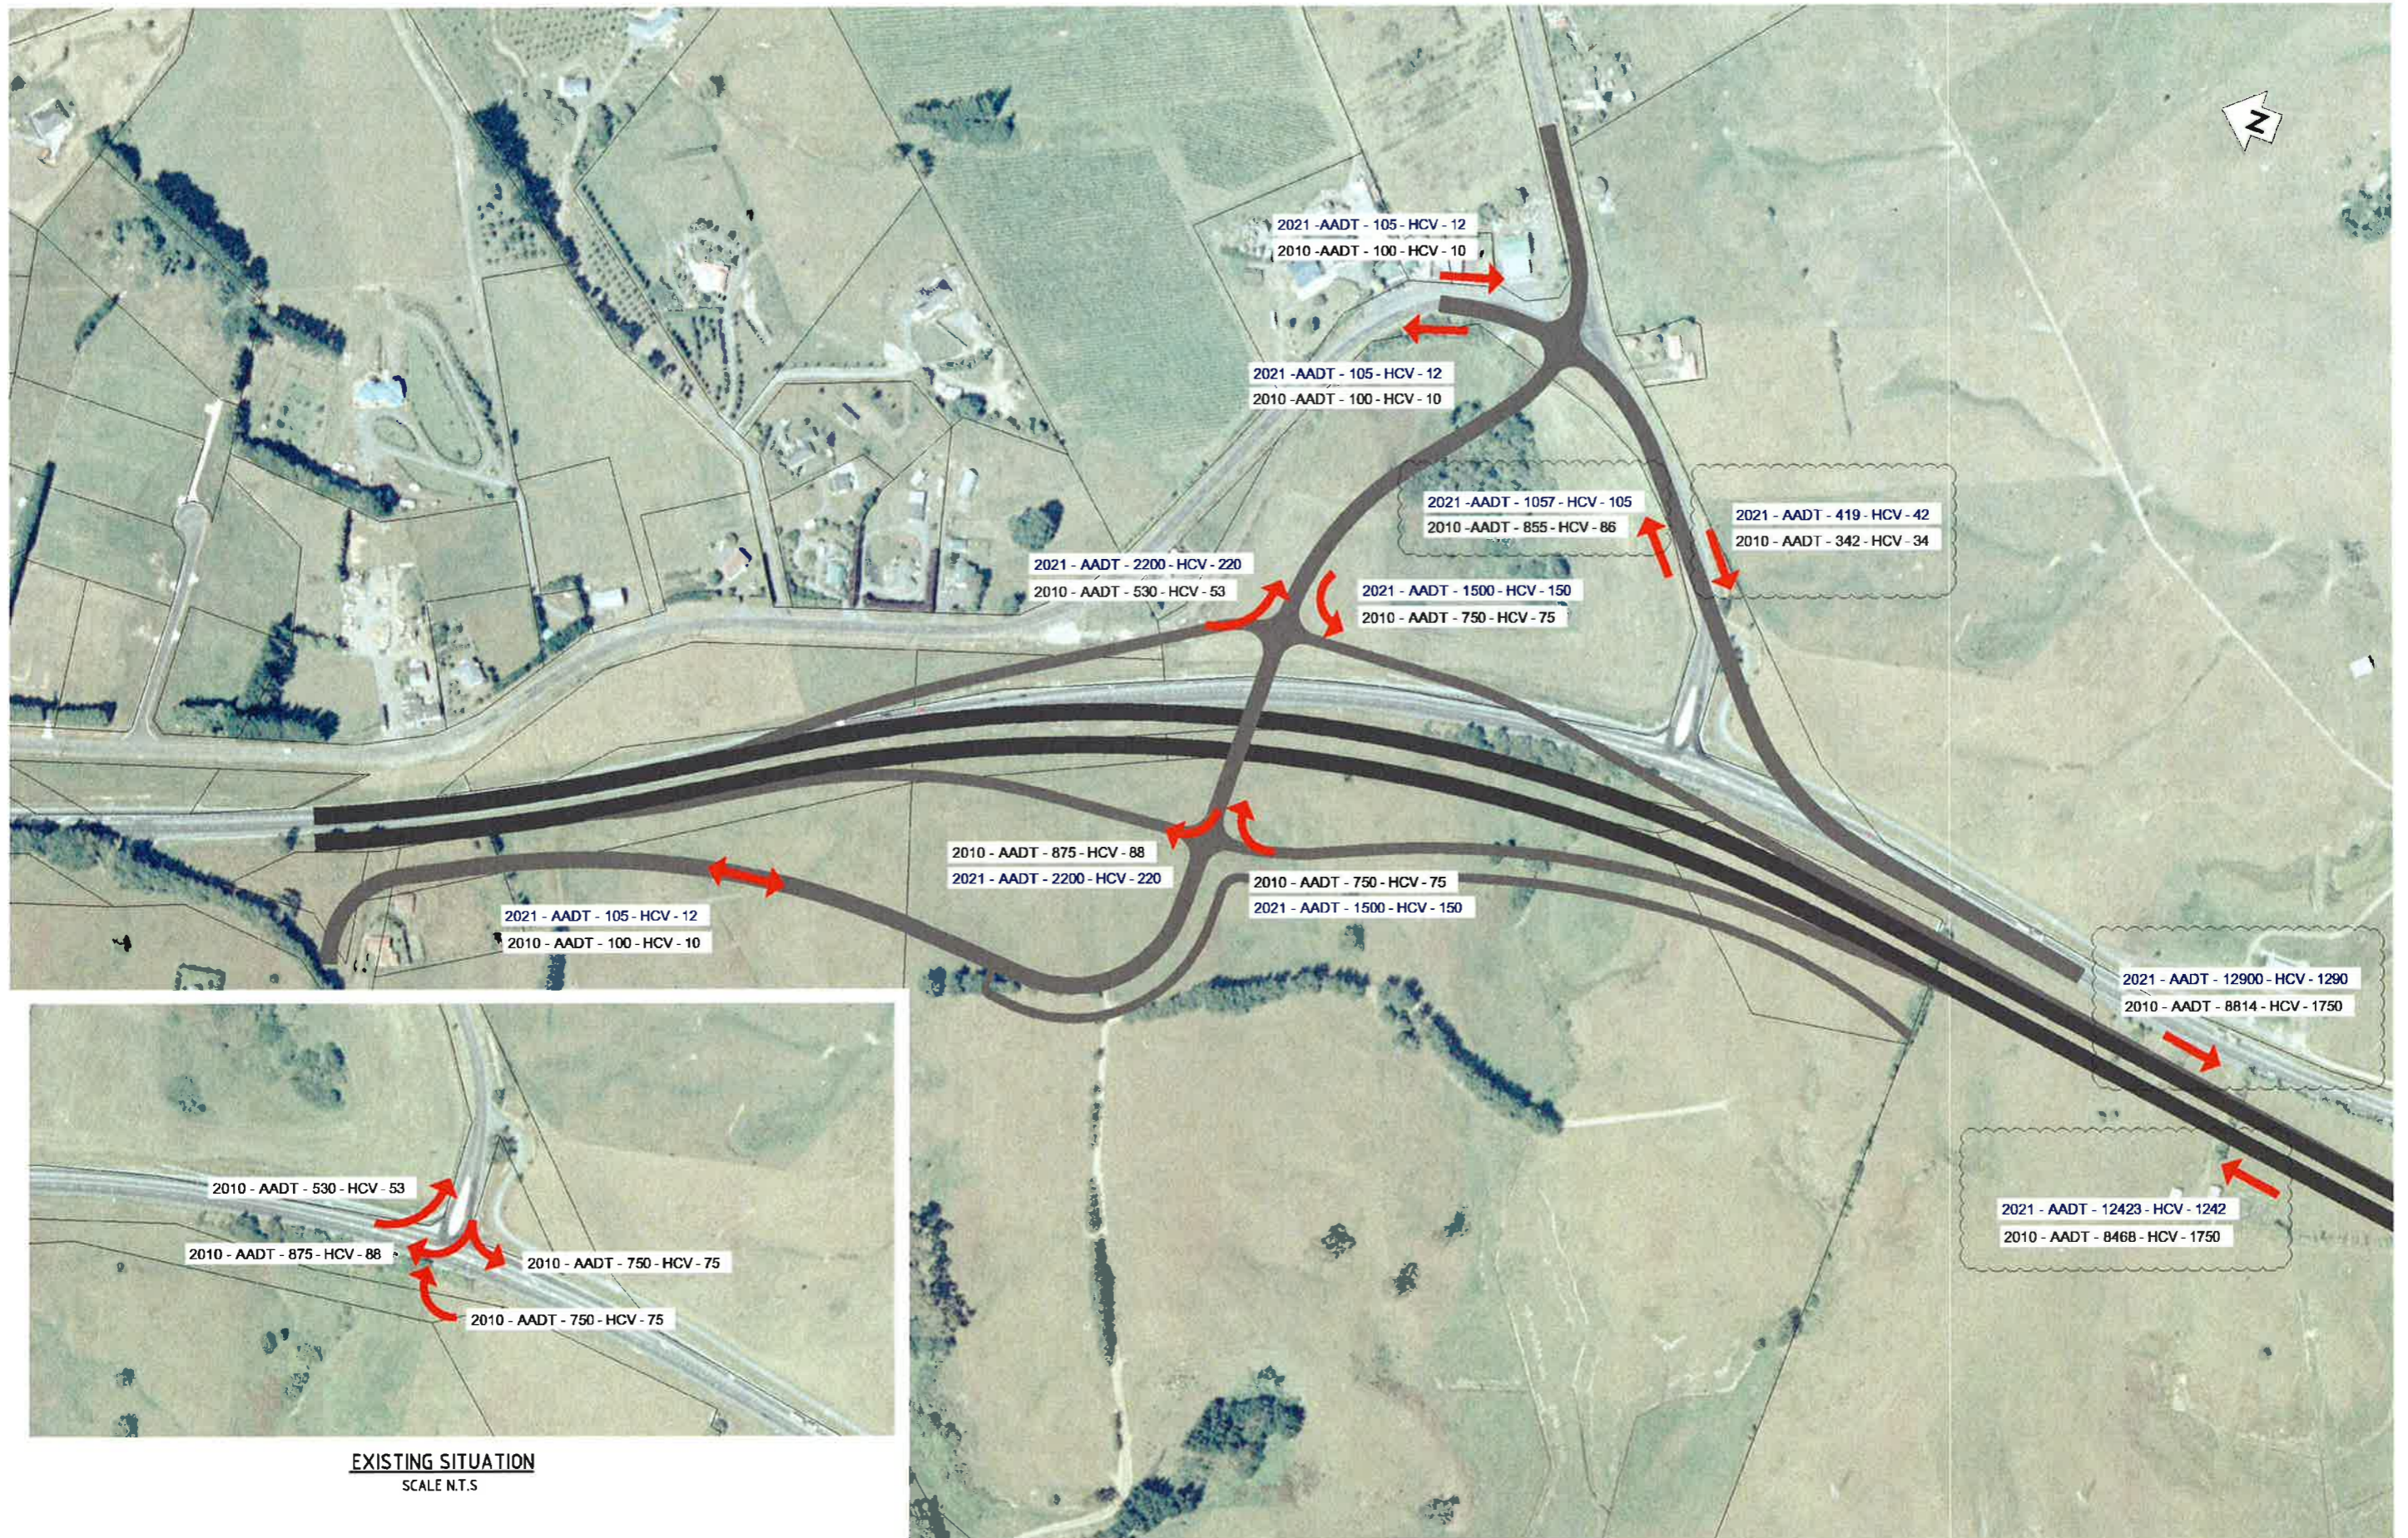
Existing and Proposed Roads at Te Kauwhata
